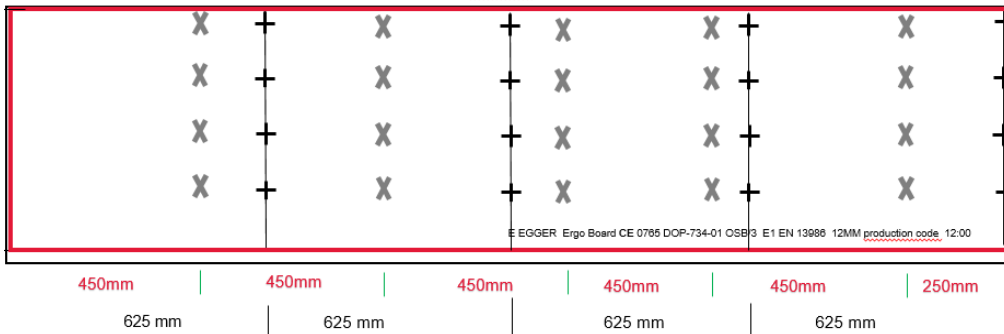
Fasten the first Ergo Board with a fastener spacing of 150 mm.
